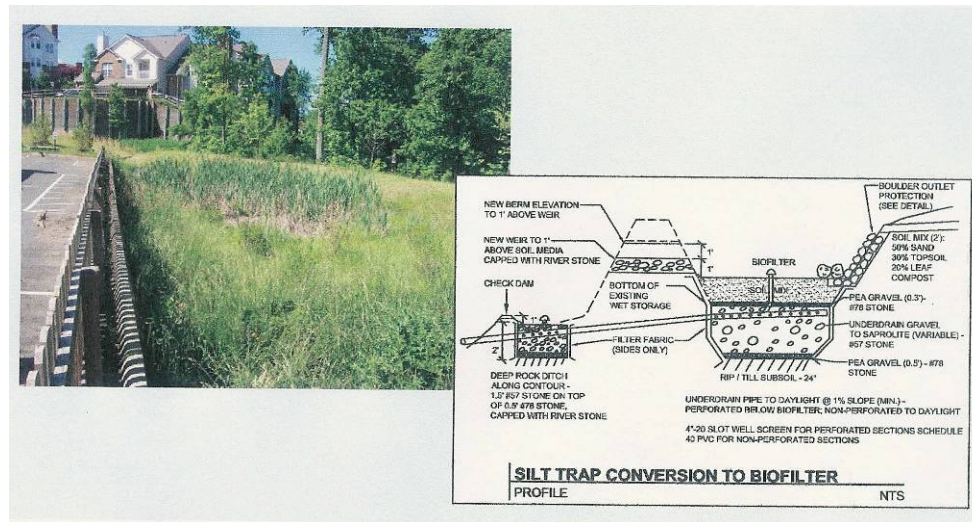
Construction inspectors should be involved in confirming as-built plans (Source: CWP 2008)
